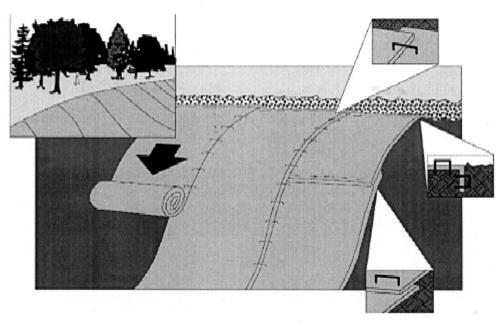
Typical Installation of Erosion Control Blankets on a Slope
